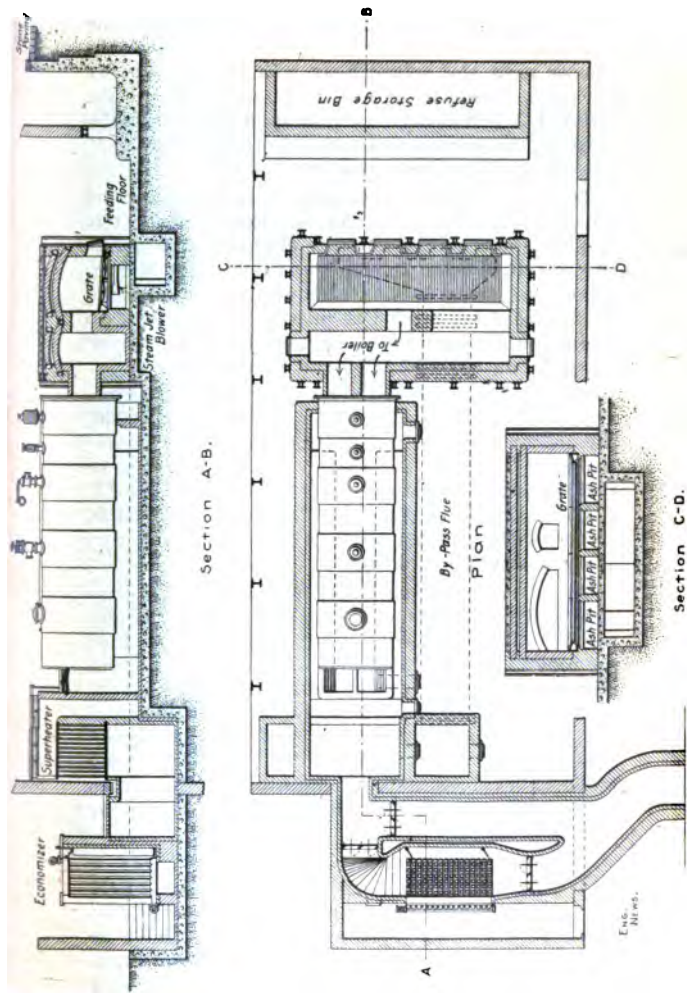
PLAN AND SECTIONS OF THE REFUSE DESTRUCTOR, WATFORD, ENGLAND.
